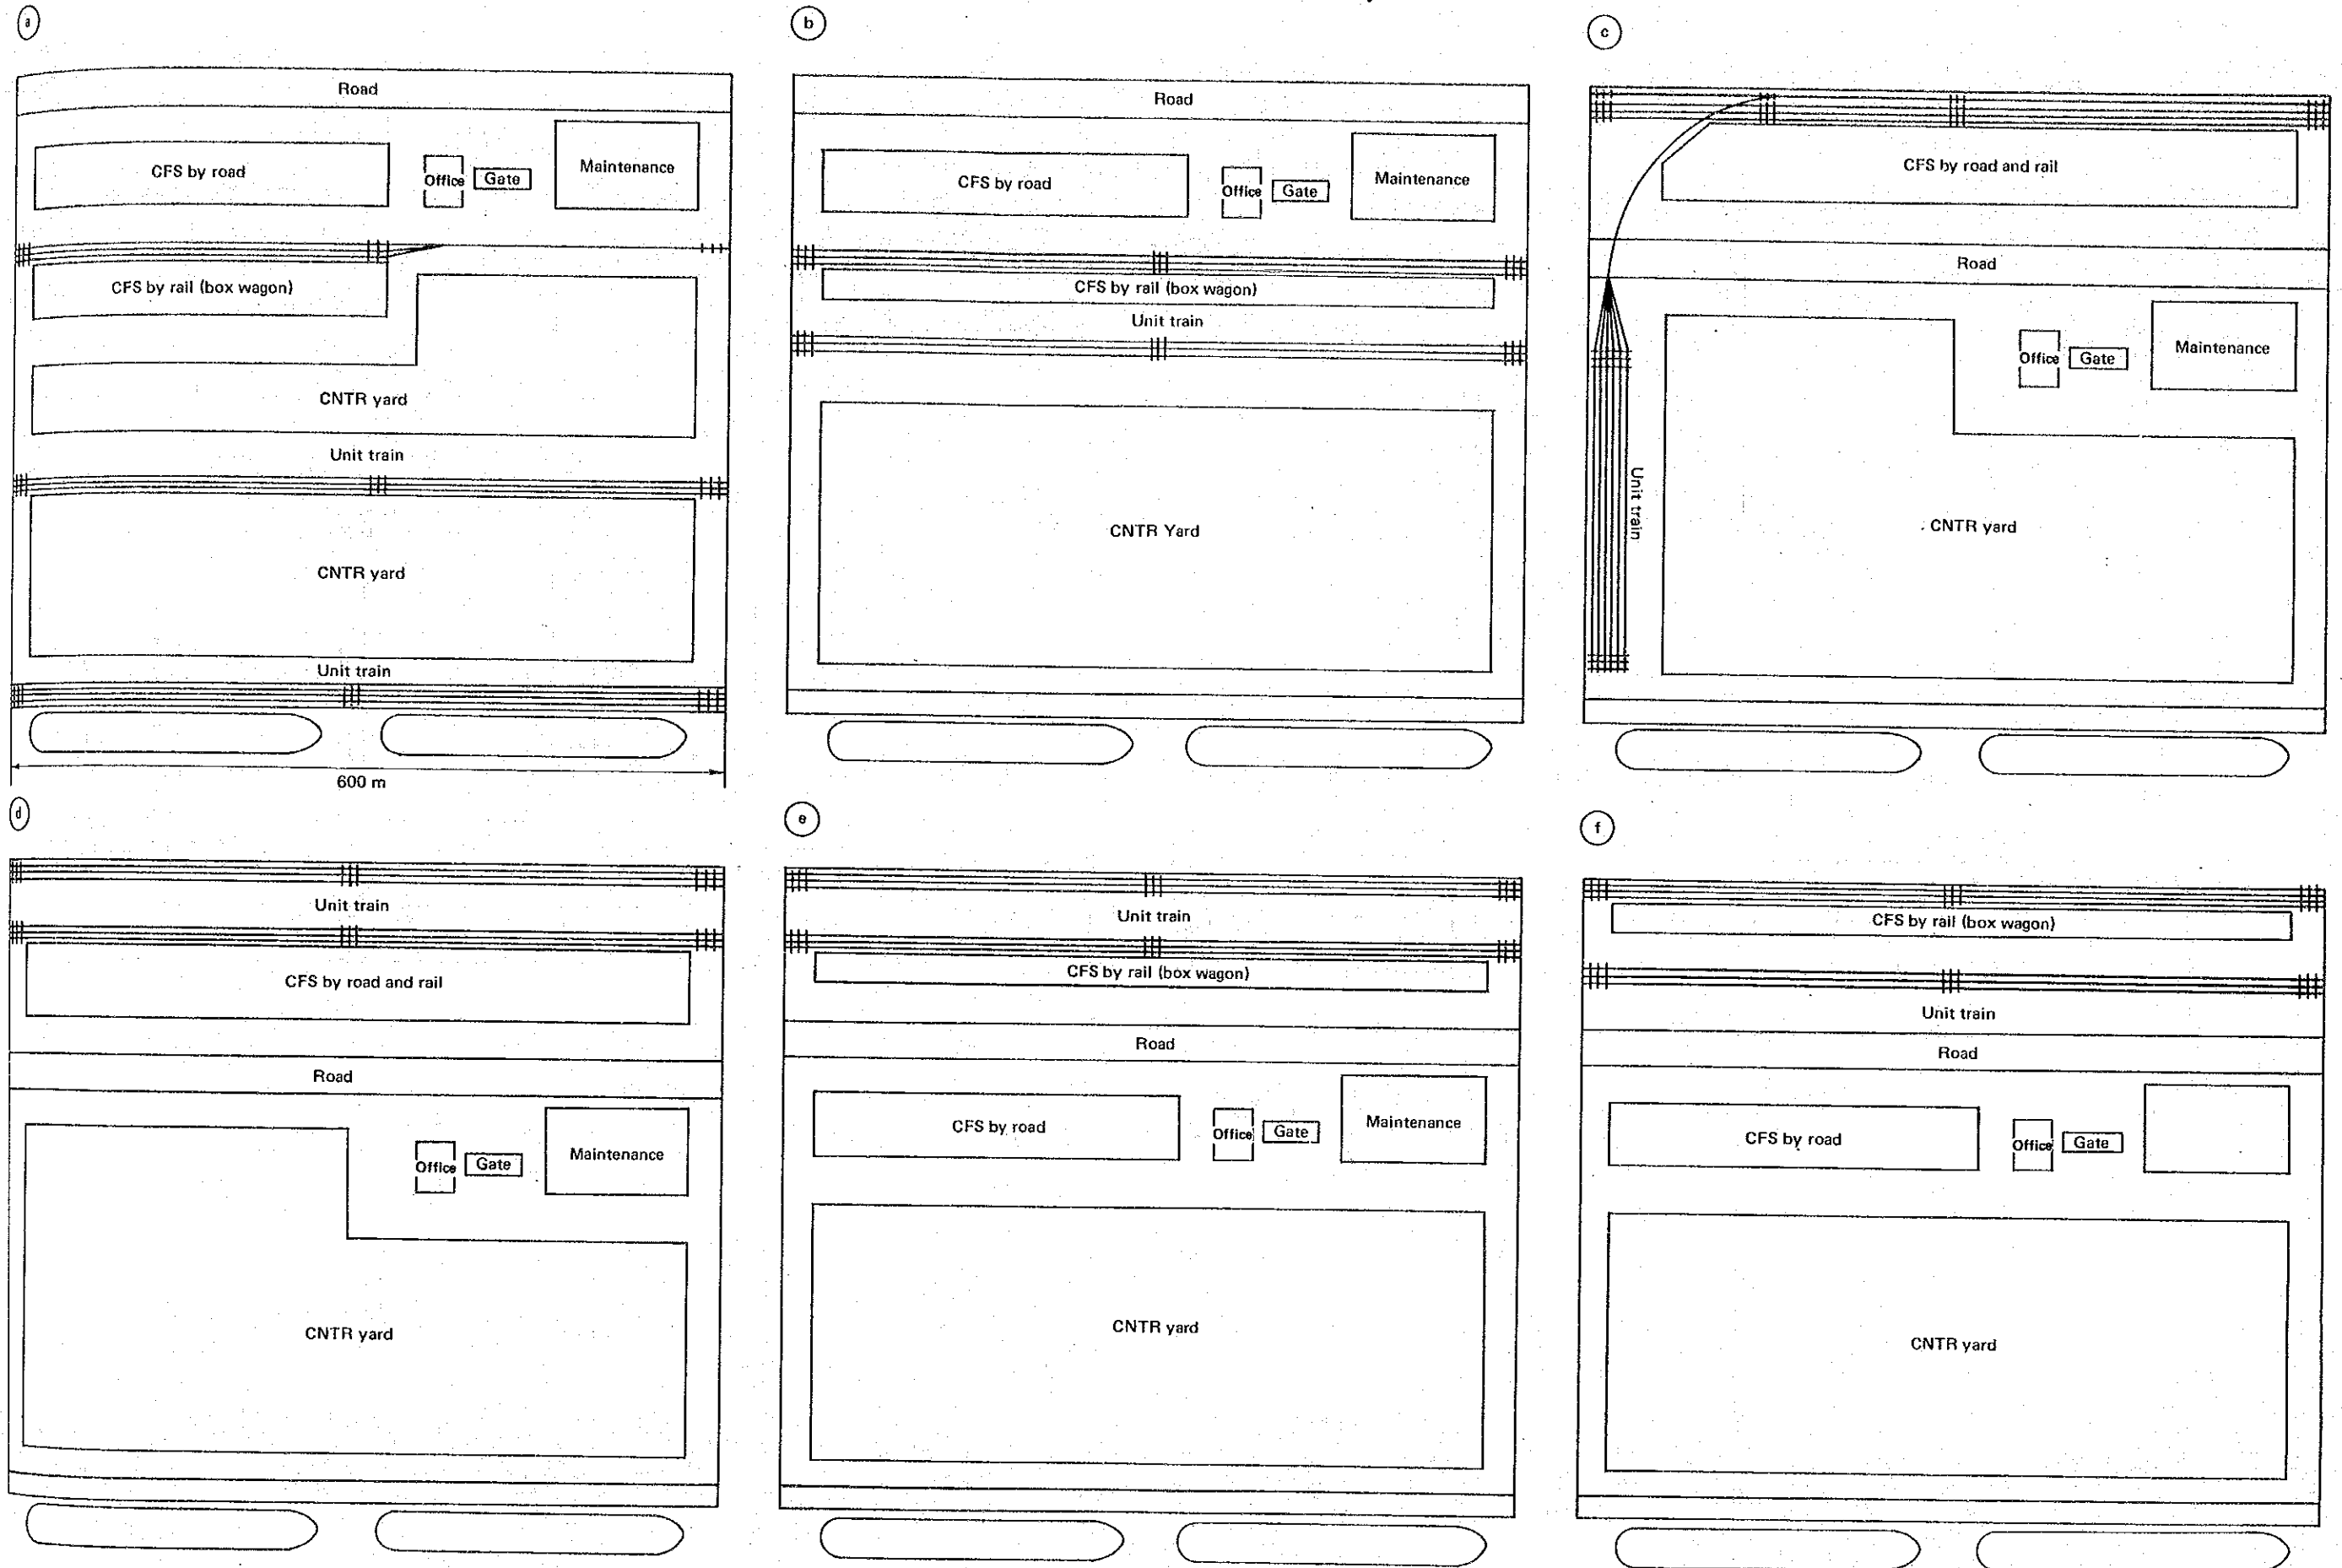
Basic Layout of Port Terminal (Master plan)
